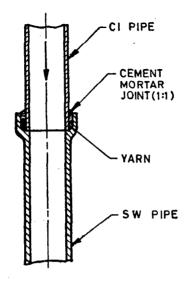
JOINTING C I PIPE TO STONEWARE PIPE
